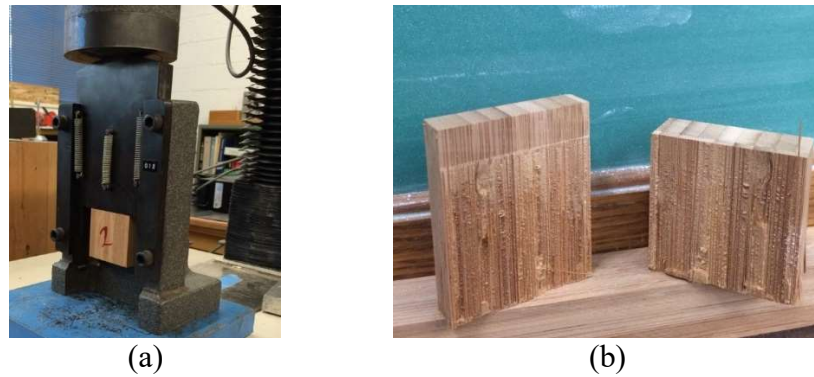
Shear test: a) test setup; b) specimen shear failure surface
